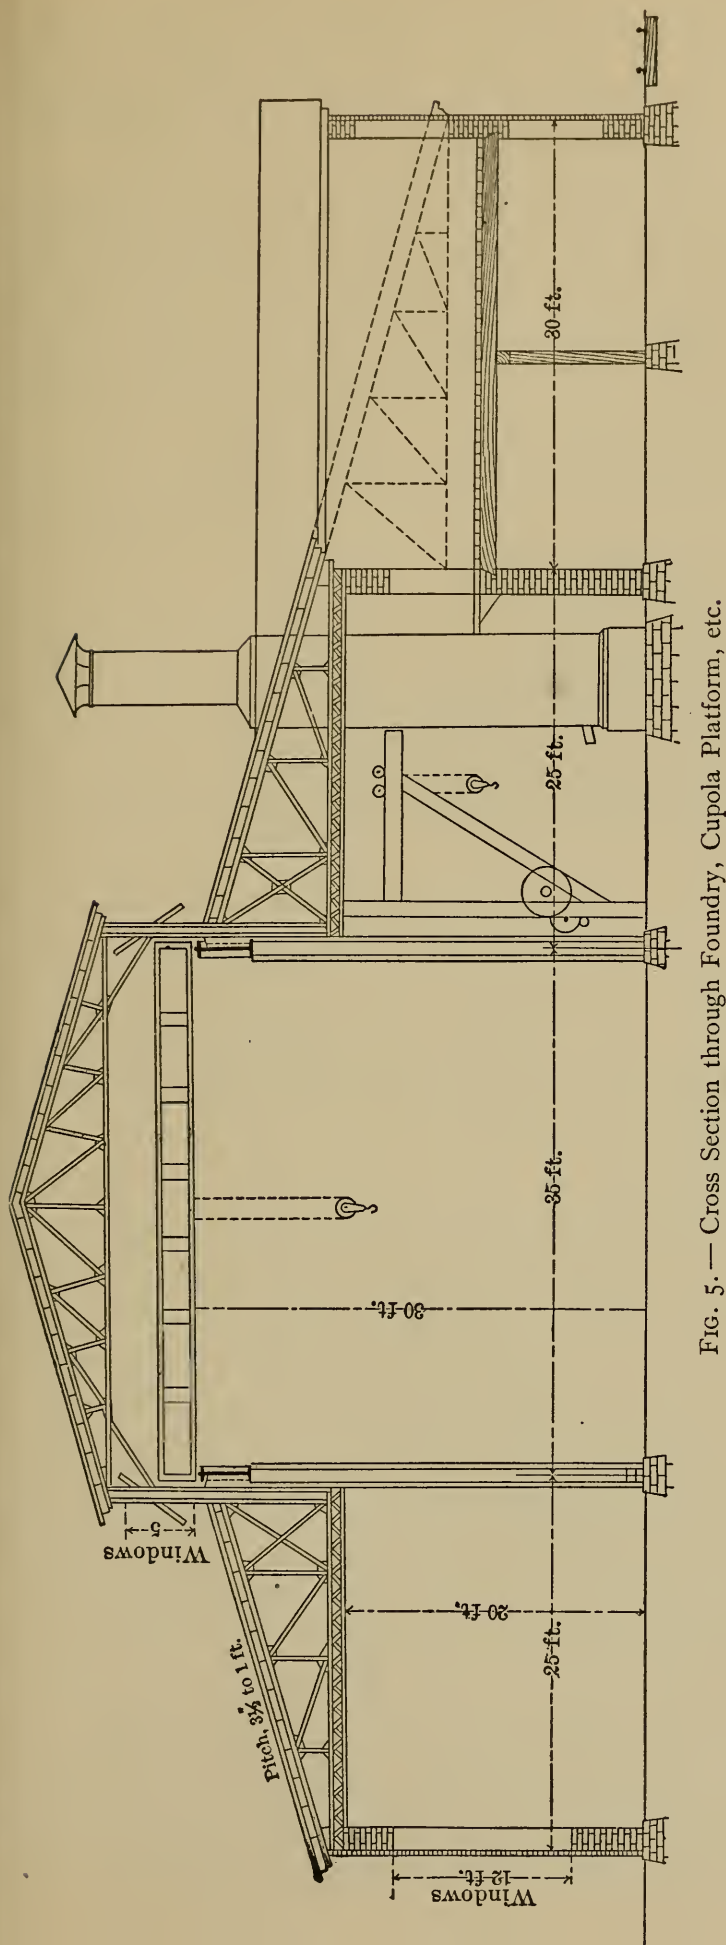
Cross Section through Foundry, Cupola Platform, etc.
